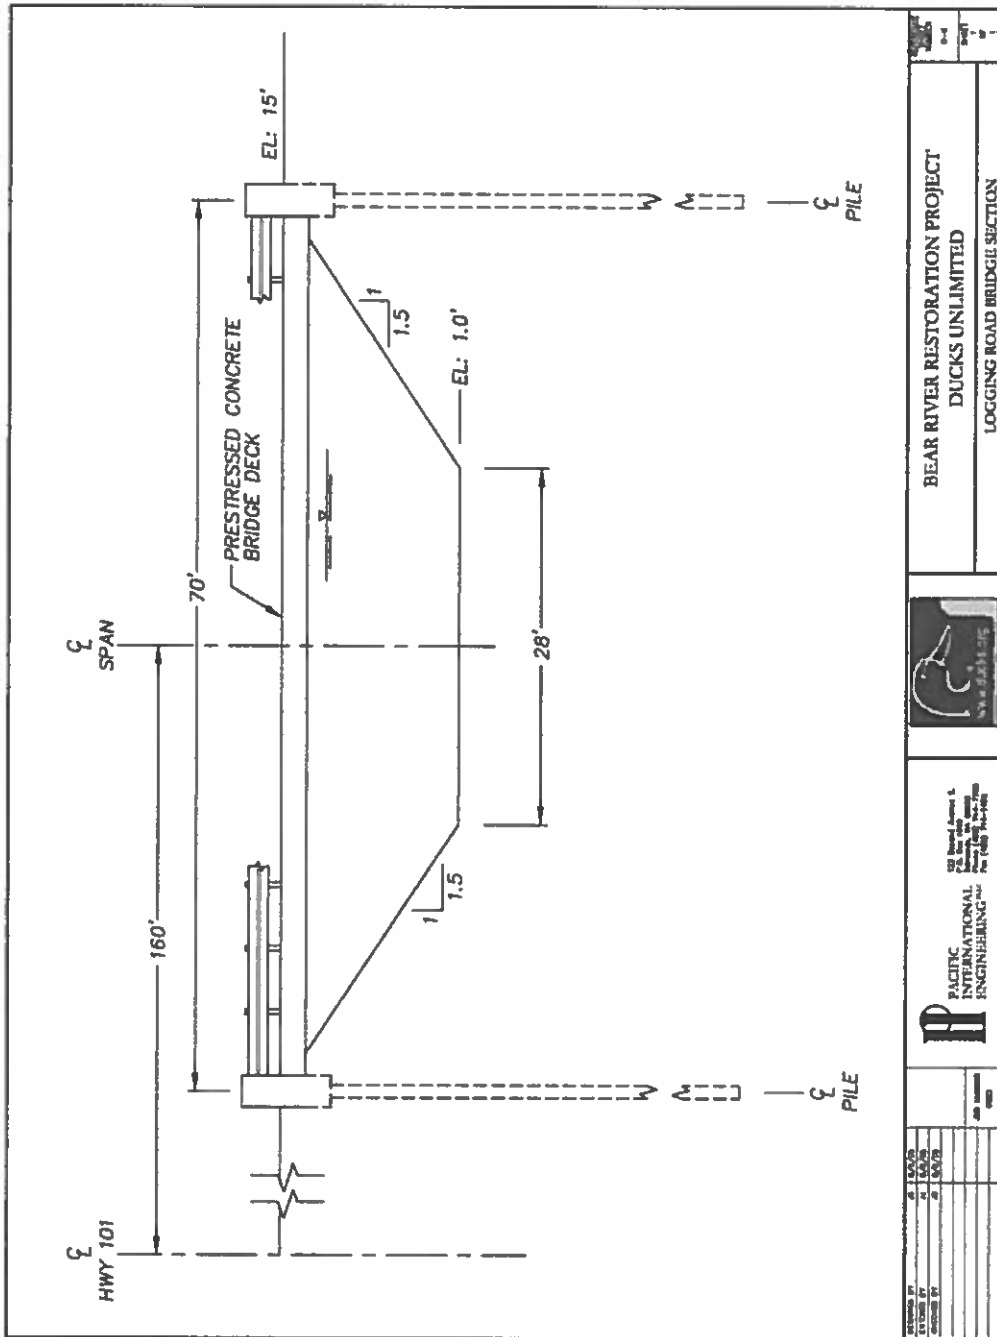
Preferred Alternative Logging Road Bridge Section
